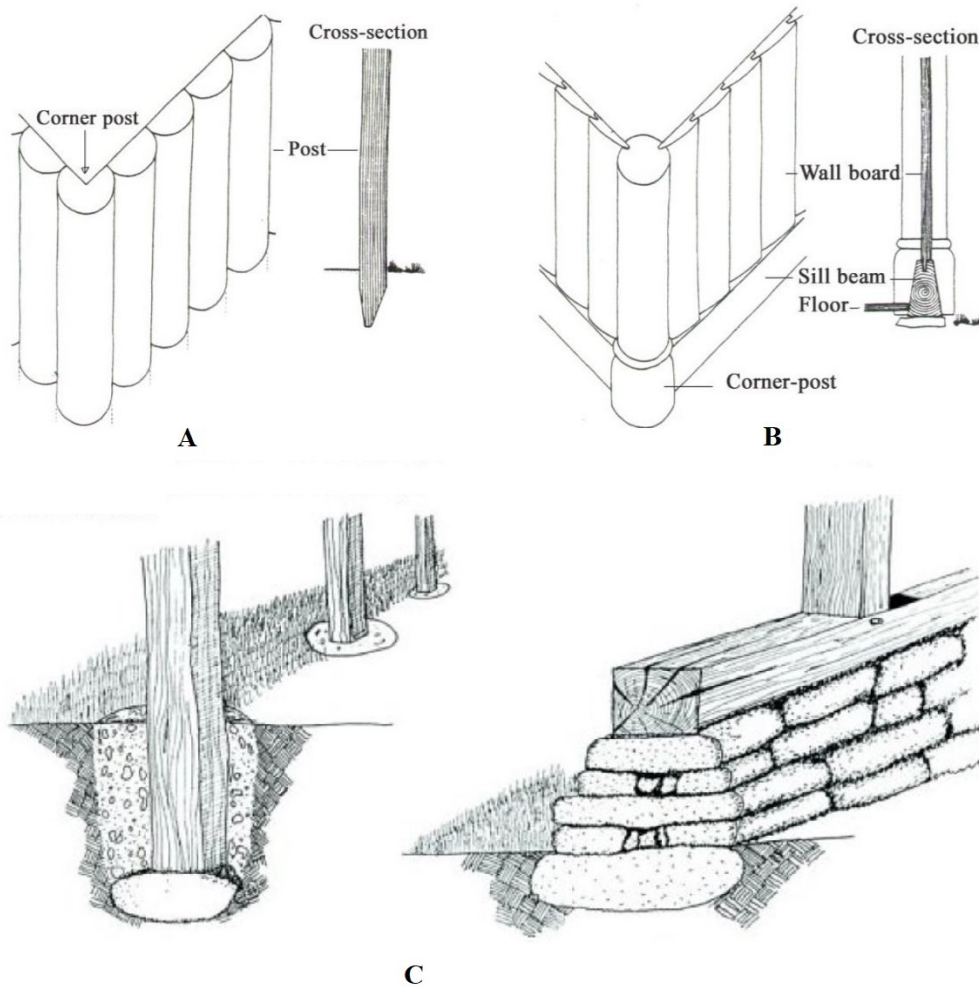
Stave constructions: A) Palisade wall, B) Corner-post with sill beam [9],
